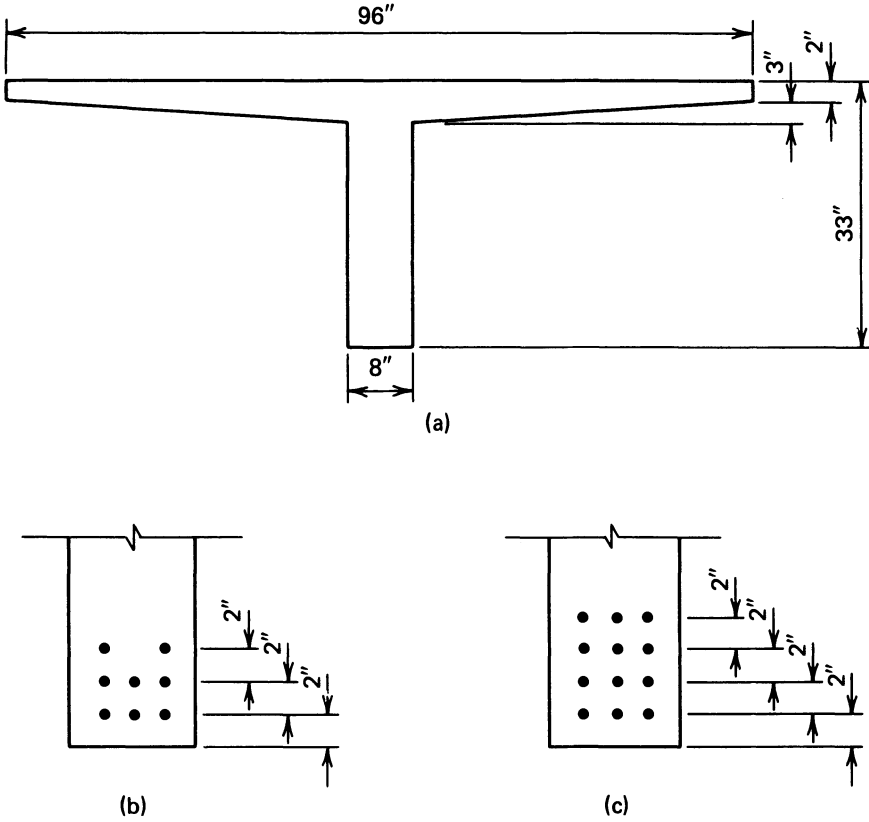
Cross section and details of T-beam used in I.P. 9-12.
